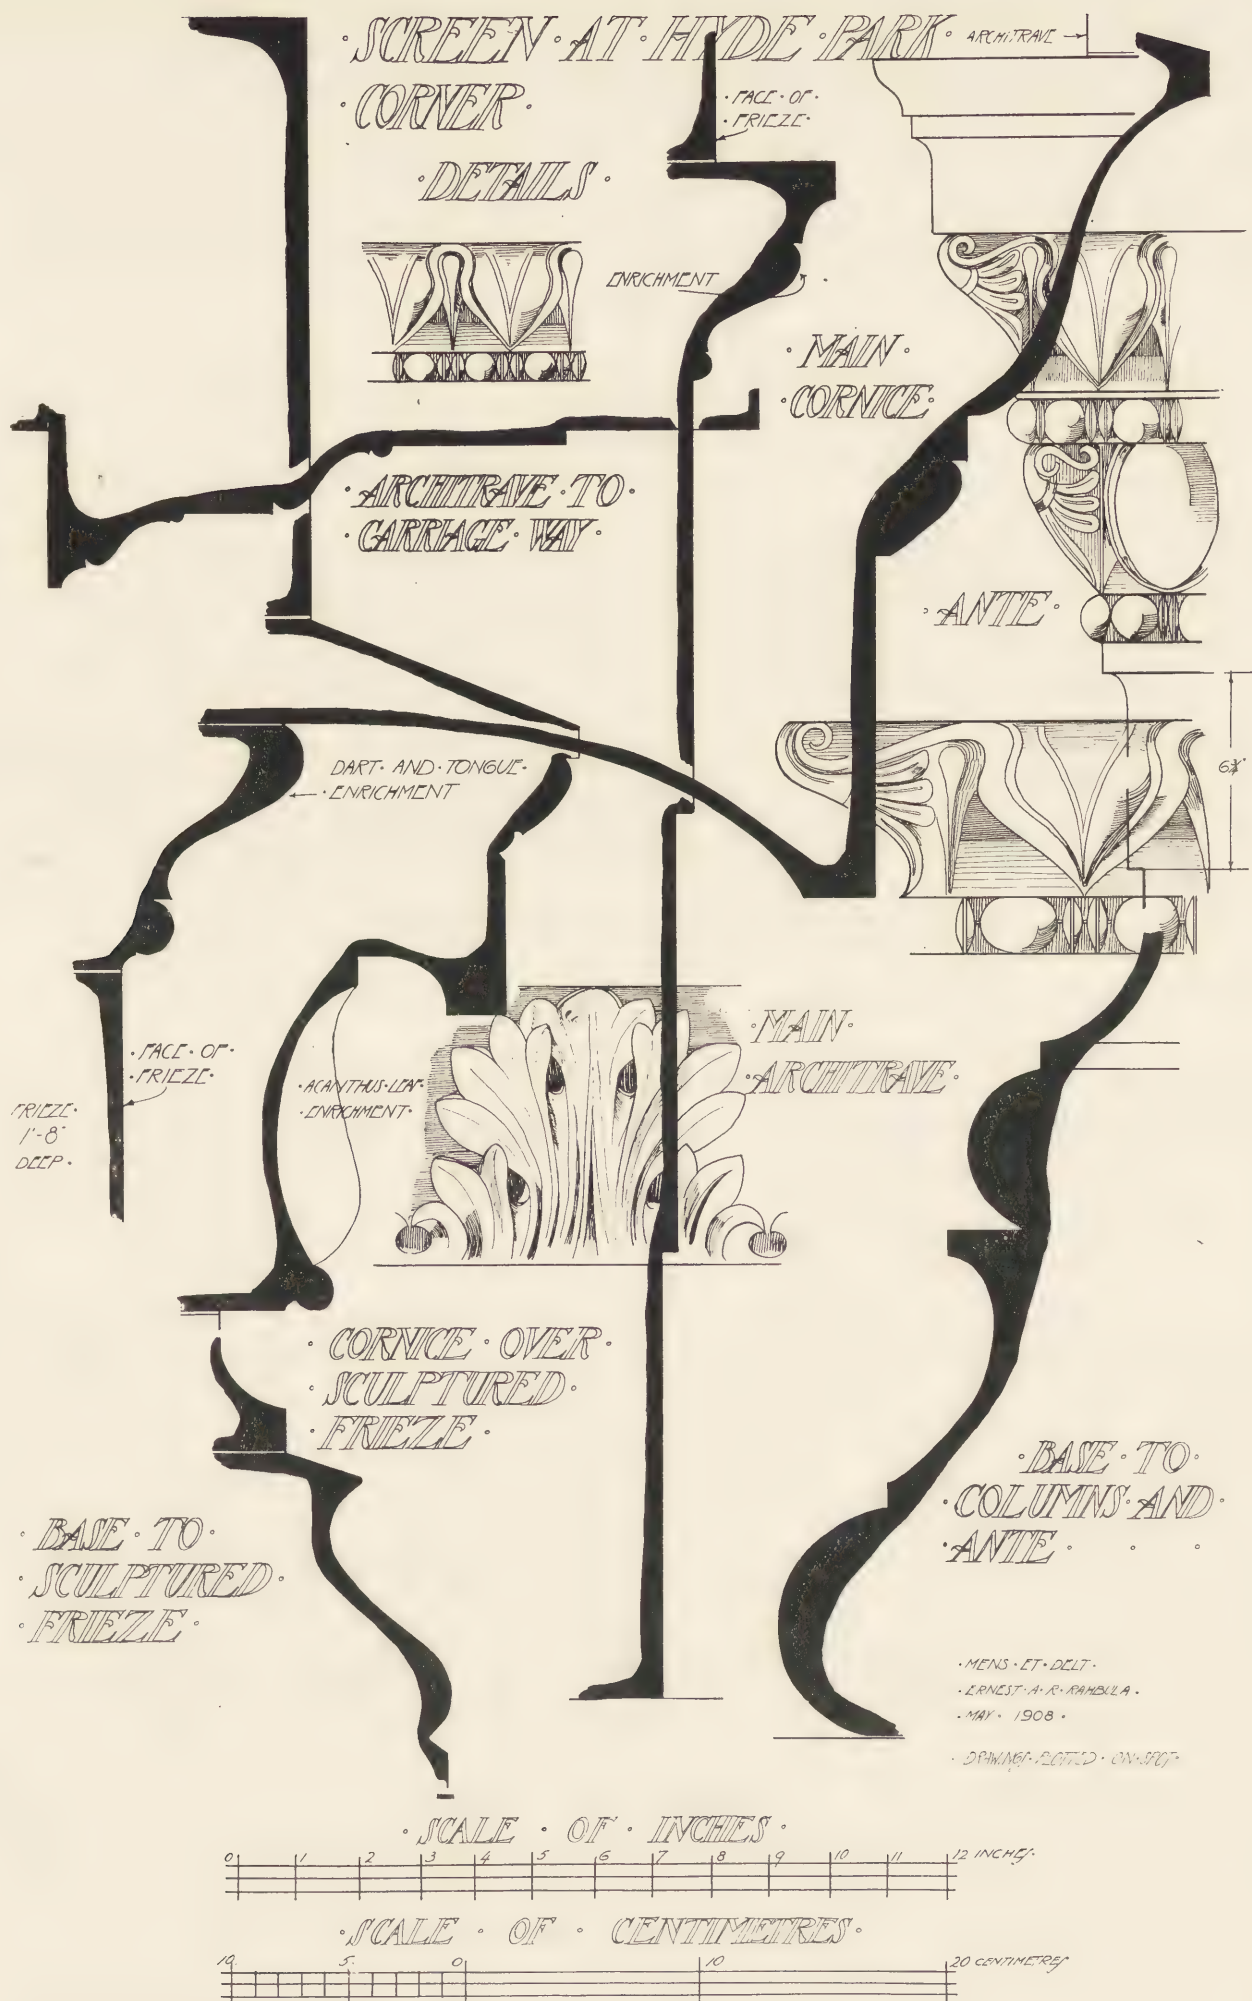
DETAIL OF CENTRE BAY OF SCREEN AT HYDE PARK CORNER, LONDON. · DECIMUS BURTON, ARCHITECT.
